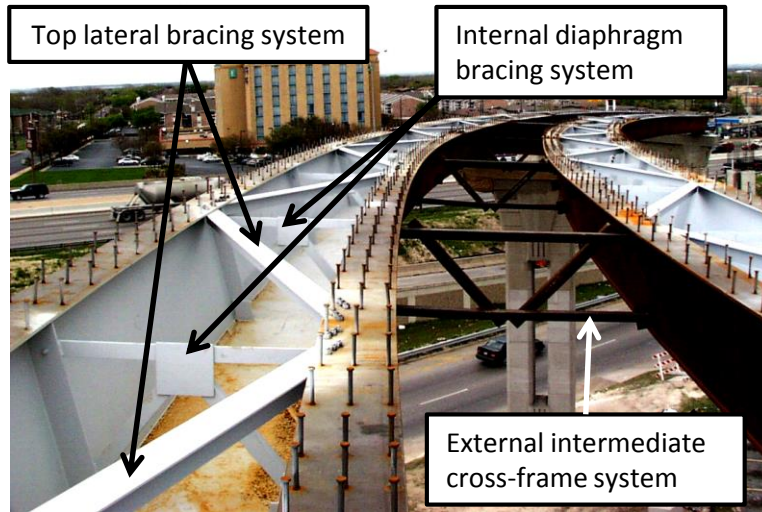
Bracing Systems for Steel Tub Girders (Photo Courtesy of T. Helwig)
